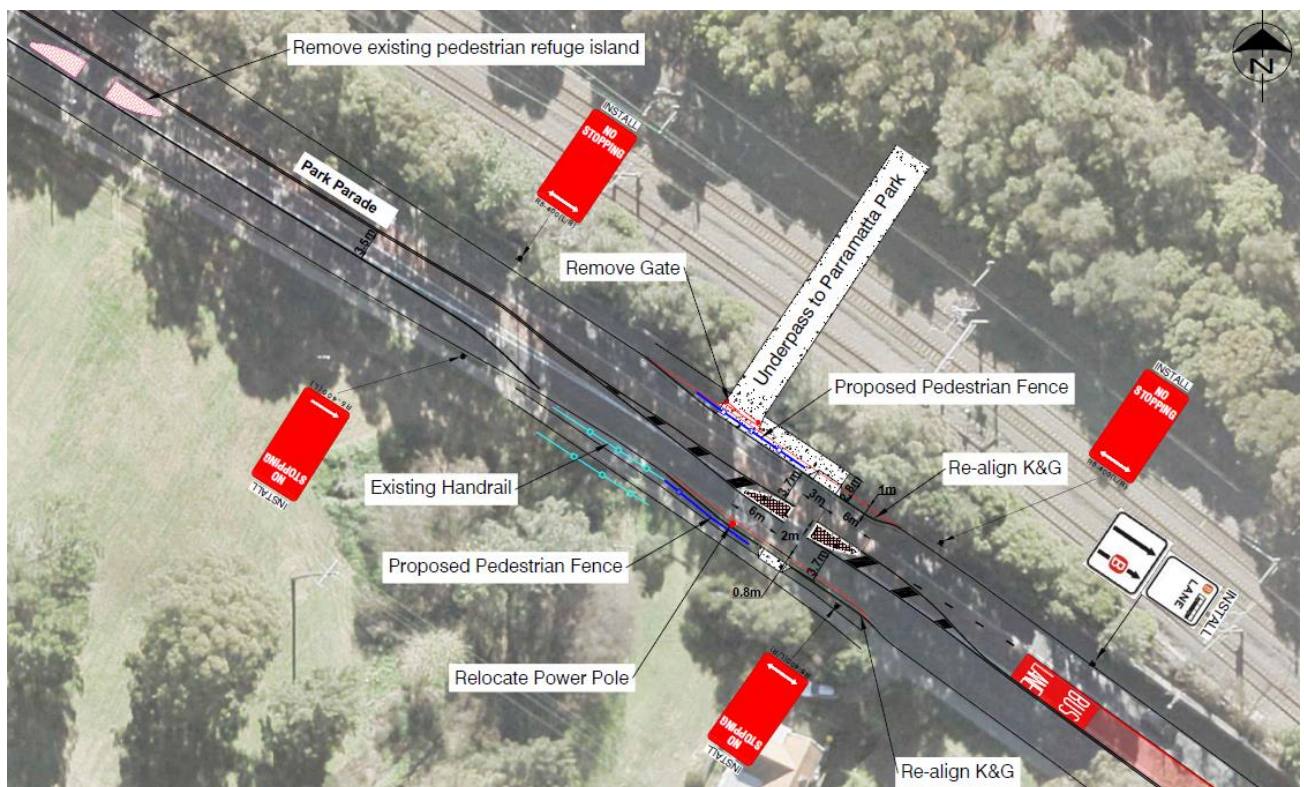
Concept plan showing the proposed pedestrian refuge island with footpath widening in Park Parade, Parramatta near the pedestrian tunnel to Parramatta Park
